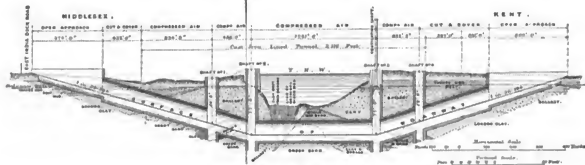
LONGITUDINAL SECTION ON CENTER LINE OF TUNNEL.
